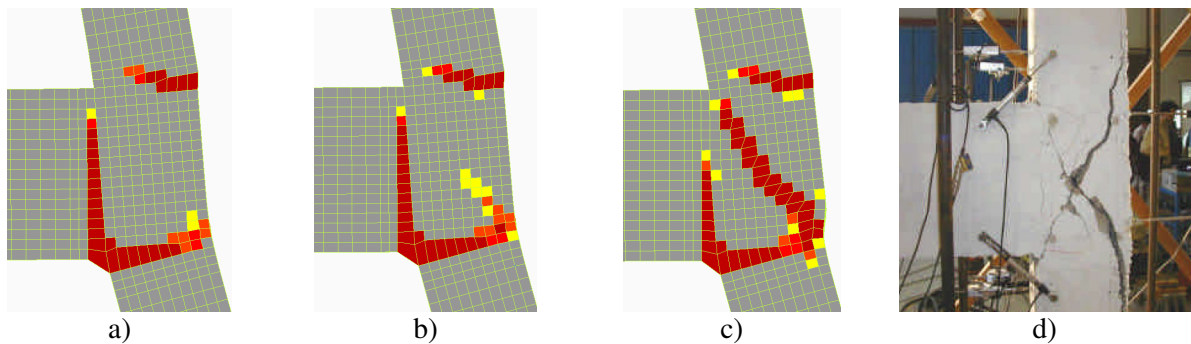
Cracking under monotonic load at different top drift levels: a) 1.09%; b) 1.16%; c) 1.50%; d) cracking in the test specimen after cyclic loading
